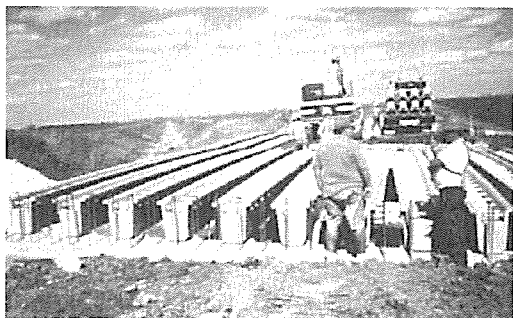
Molded FRP U-girders installed on abutments (photo: MFG)
